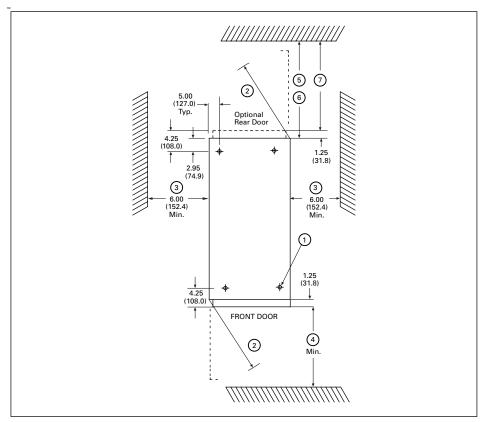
Typical Anchor Plan for MSB, Indoor or Outdoor
